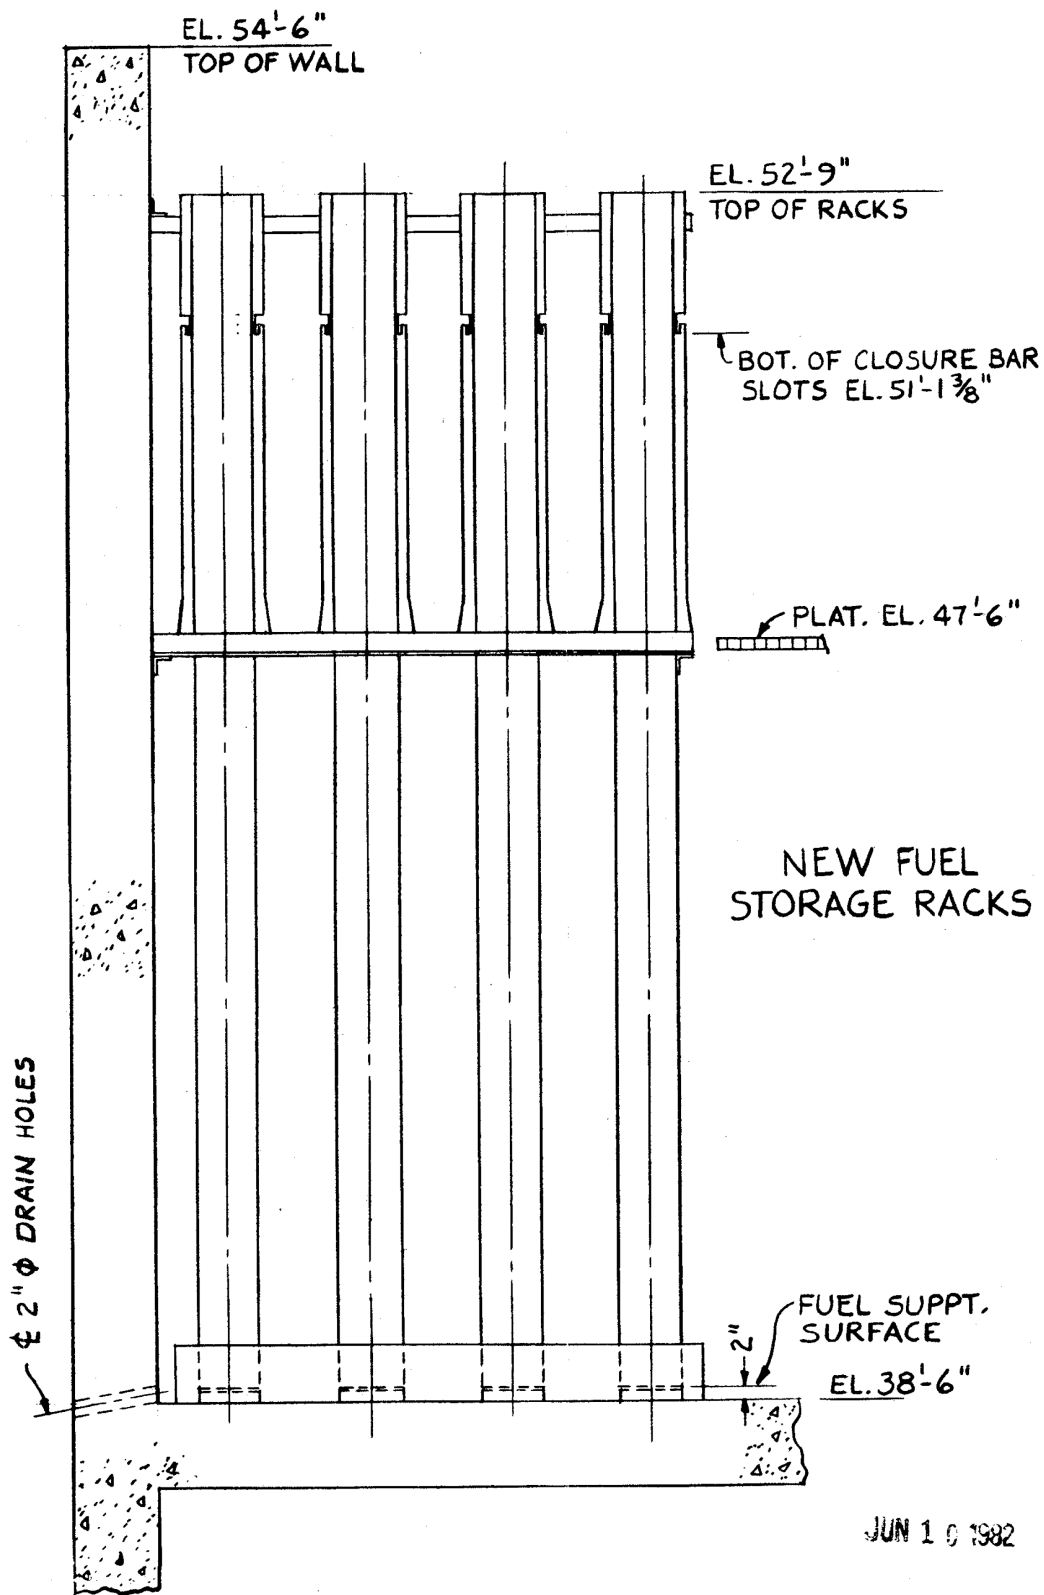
PLAN OF NEW FUEL STORAGE RACKS
